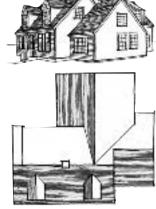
Expanded house. A great deal of space has been added without compromising the main house's lines (top). The roof plan (bottom) can help you and the clients envision how the old and new fit together.
